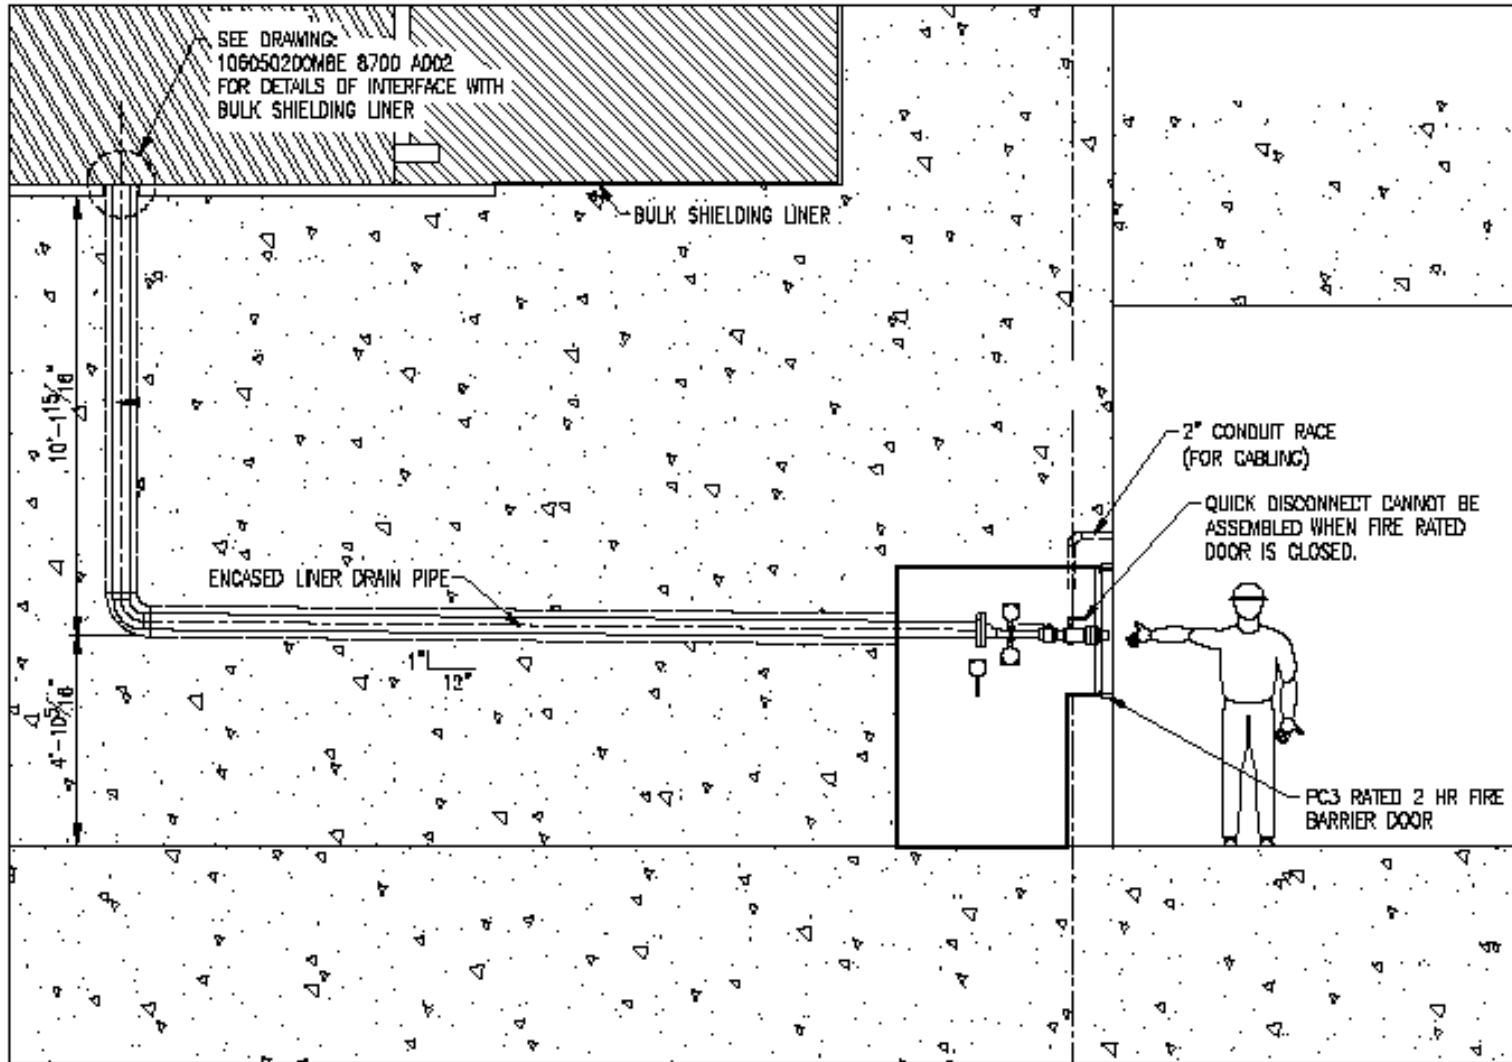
Schematic Diagram of Bulk Shielding Liner Spill Drainage Provision
